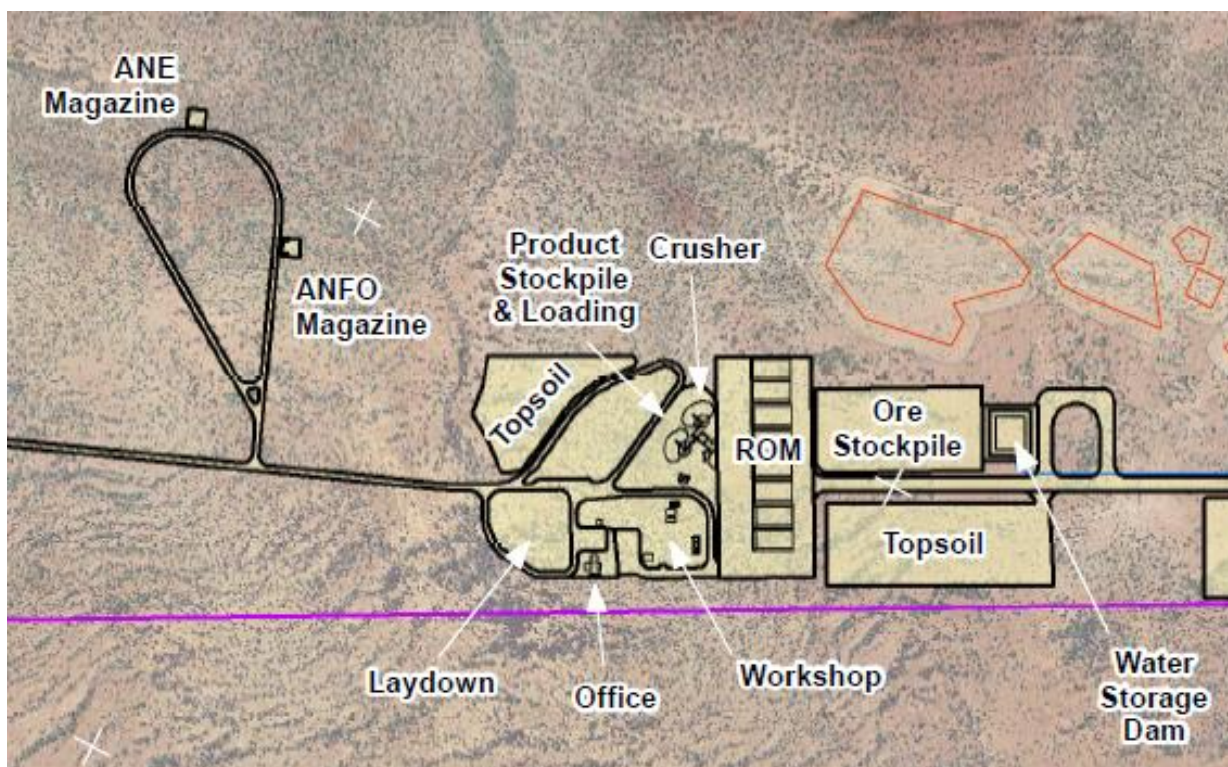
Beebyn-W11 Processing Infrastructure and Site Set-up Layout
